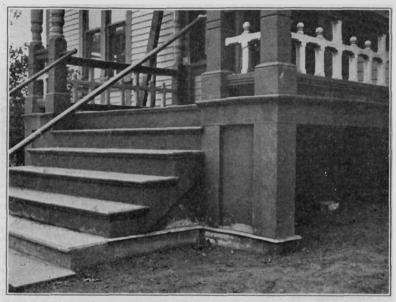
Wooden porch steps placed on concrete base and also shielded.
